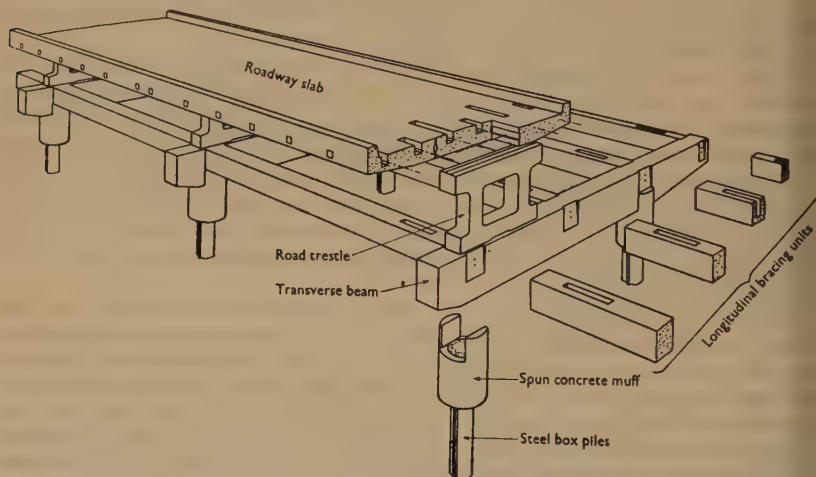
PERSPECTIVE OF TYPICAL SHORE ARM BAY
